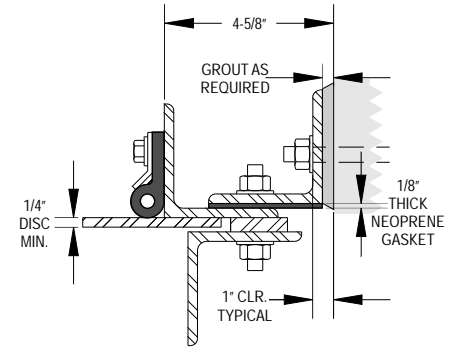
Series 763- Stainless Steel Surface Mounting; Section AA
